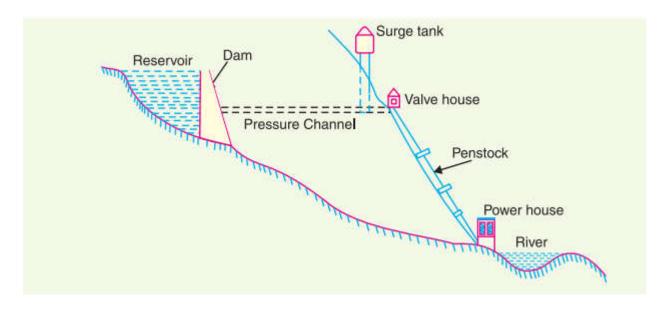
Schematic Arrangement of a Hydro-electric plant
